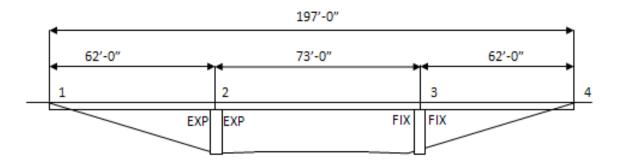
Elevation view of Cobb County bridge (COB2)
